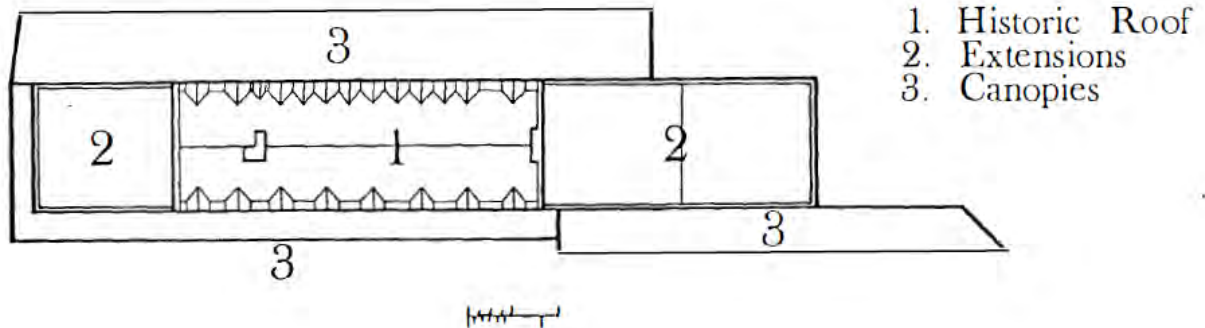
Passenger building roof location plan (H. Weese and Associates, 1981).
